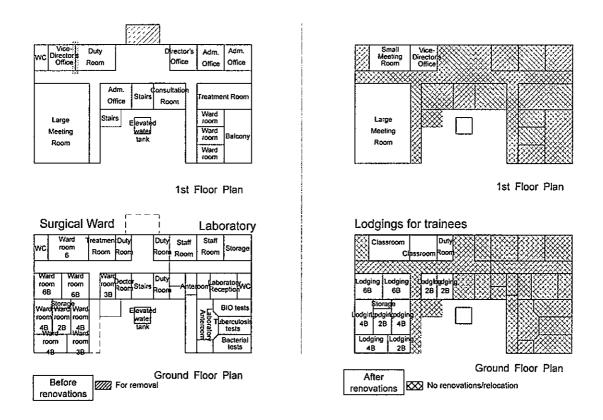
Post-Project Renovation and Relocation Plan for Existing Building A
